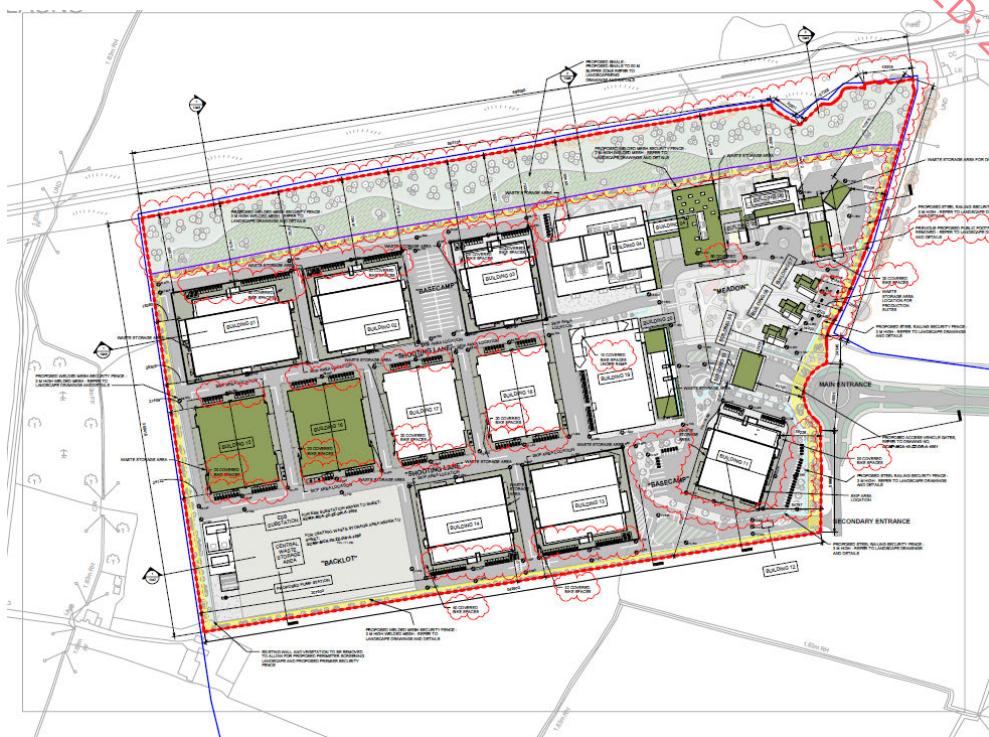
Site Layout Plan. (Source: MCA Architects, 2024).
